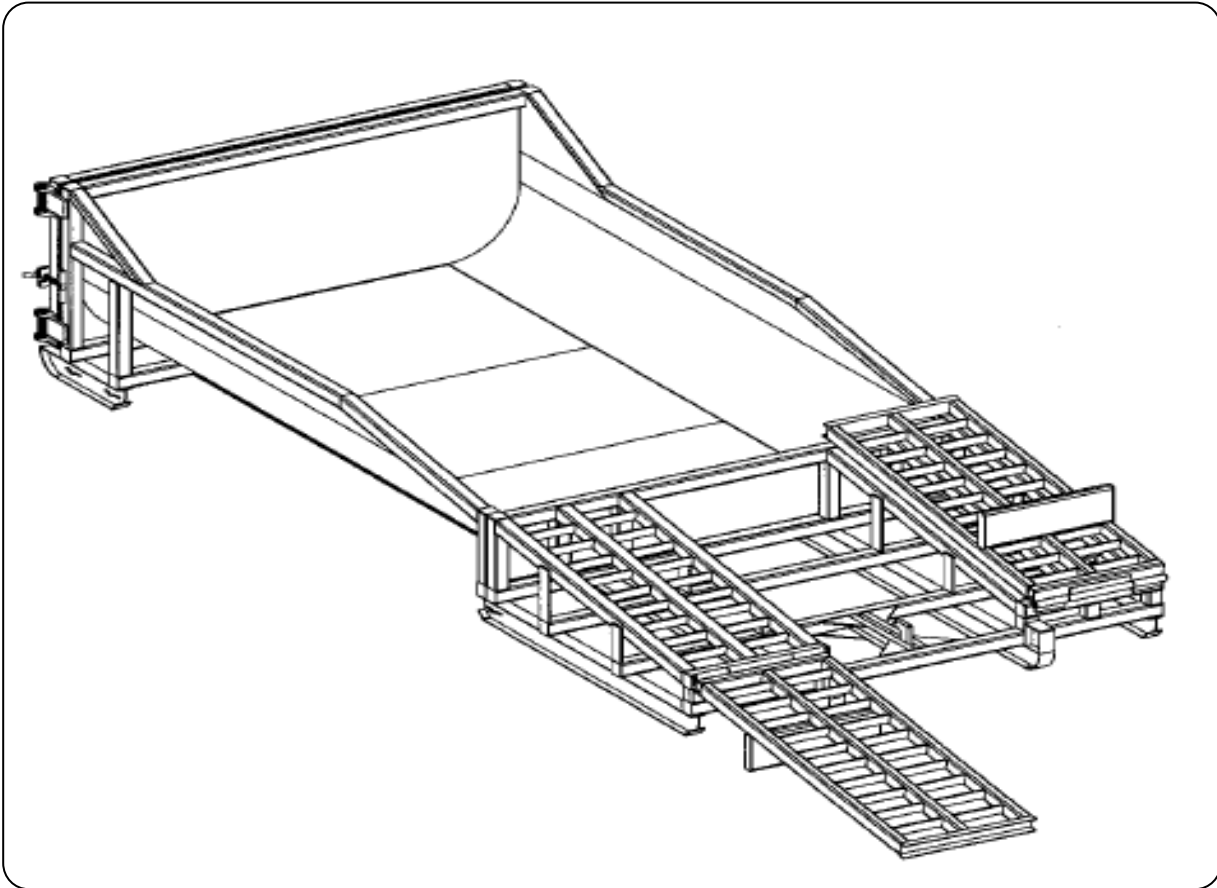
9. Prefabricated Concrete Washout Container with Ramp
